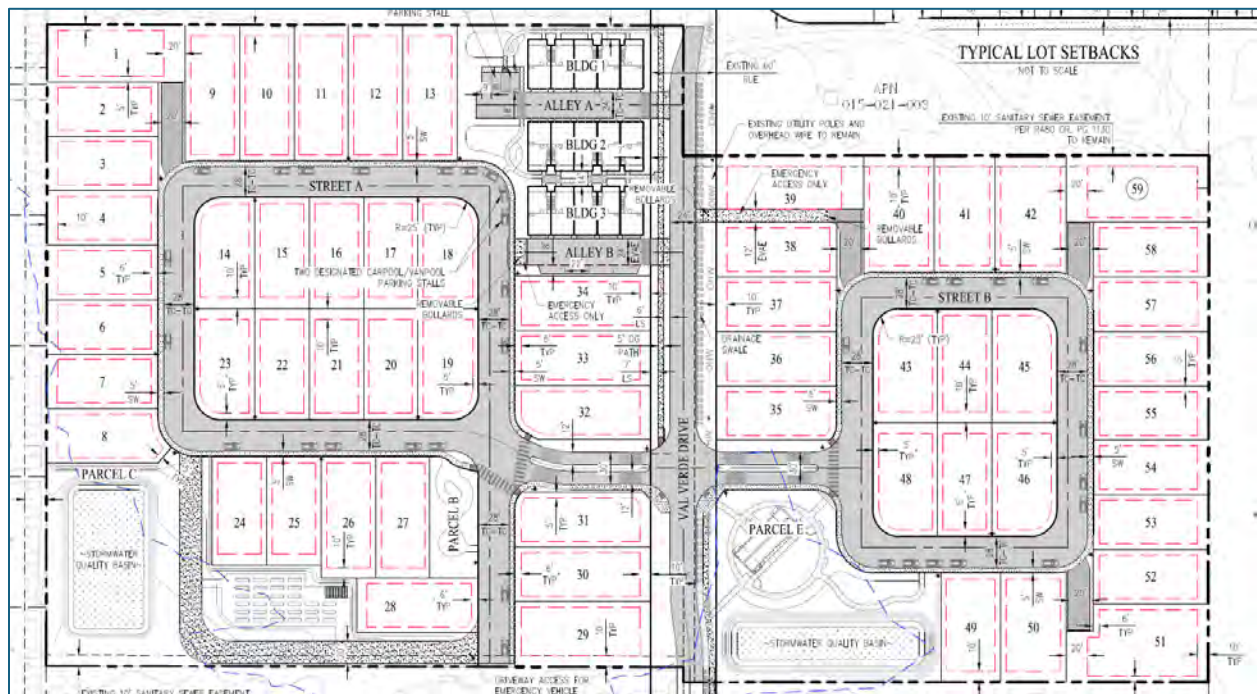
Proposed subdivision layout, building envelopes, on-site improvements, etc.
